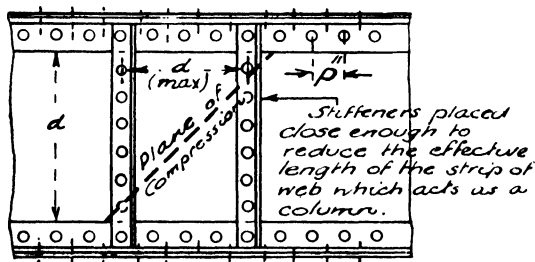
BUCKLING IN PLATE GIRDER WEB.
